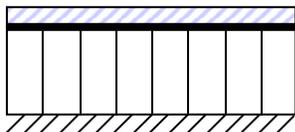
Activation of floor slab (courtesy of Meva)
